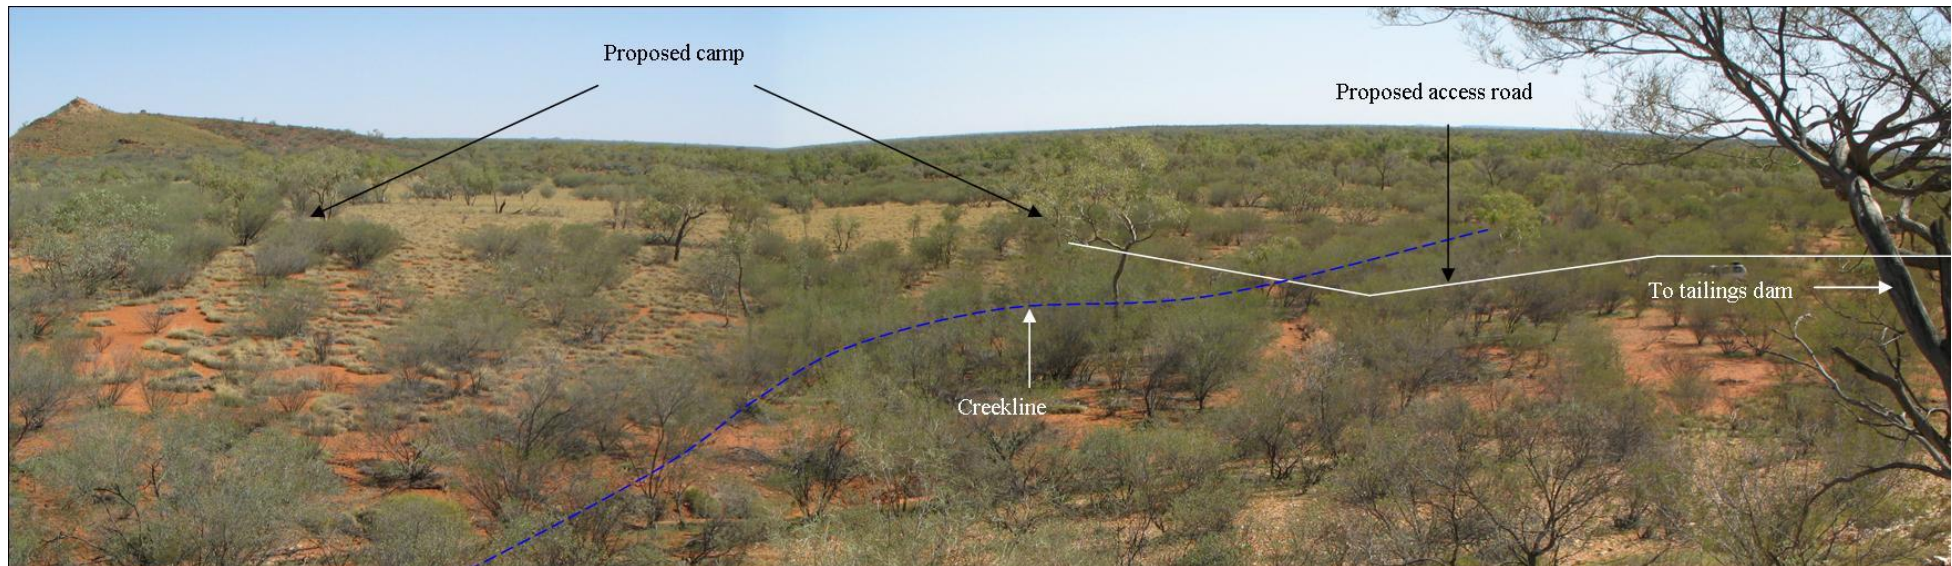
Perspective south-west over proposed camp access road. Proposed road travels between two calcrete rocky rises and over a creekline. The proposed camp access road is approximately 600m long (30/12/06: IMG_1553-1551).
